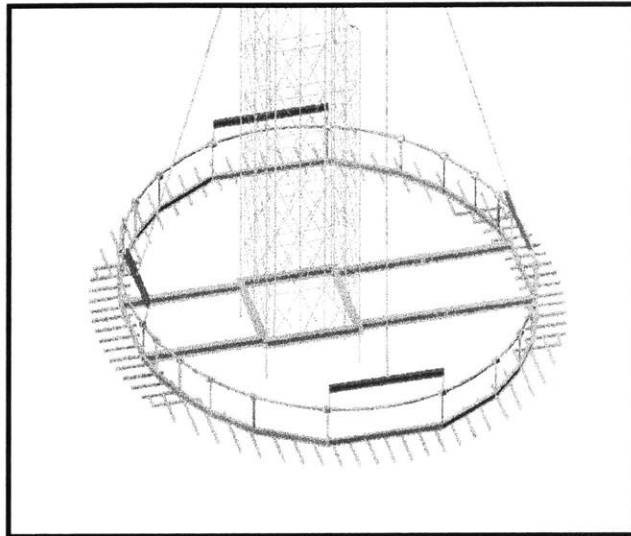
Orientation of lifting beams and cables for sequence 1
